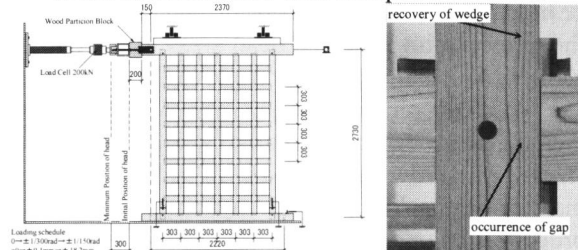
Test setup and detail of joint on lattice shear wall with compressed wooden wedges.
